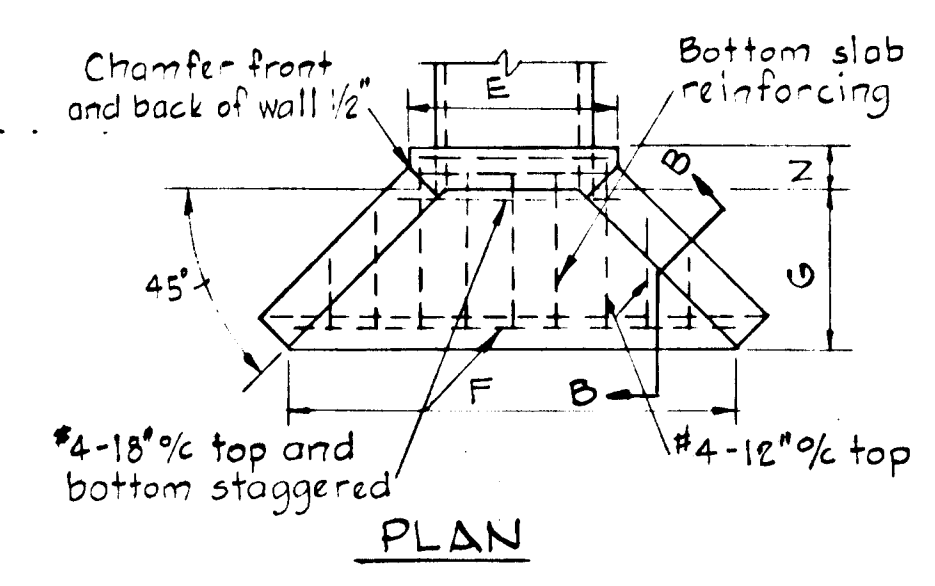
DETAIL - CUTOFF WALL AND OUTLET PAVING
